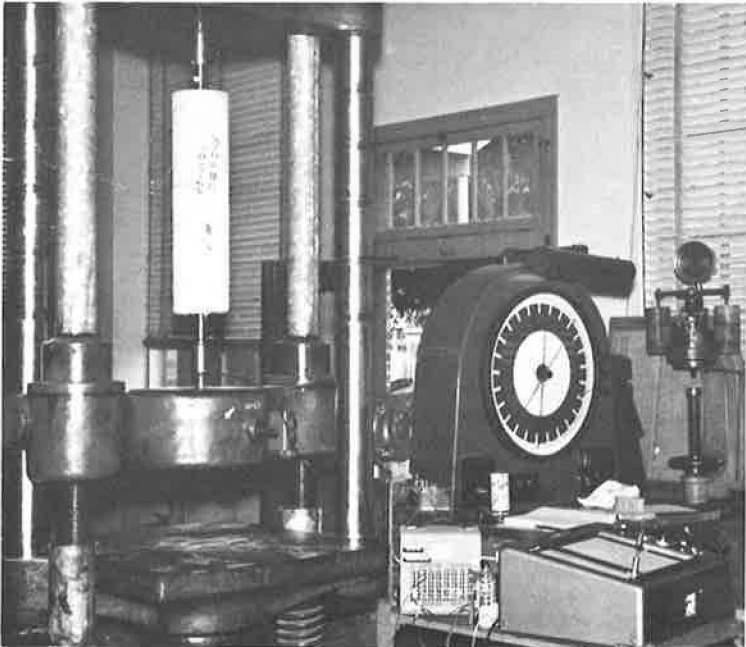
Overall view of direct tensile test concrete specimen loaded to failure.
